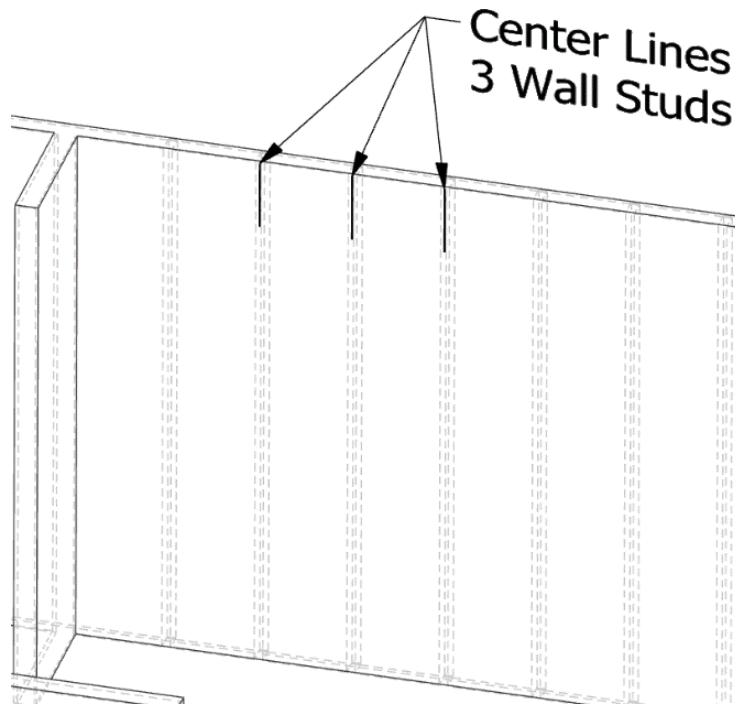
Locate the Center of Three Wall Studs Near the Ceiling
